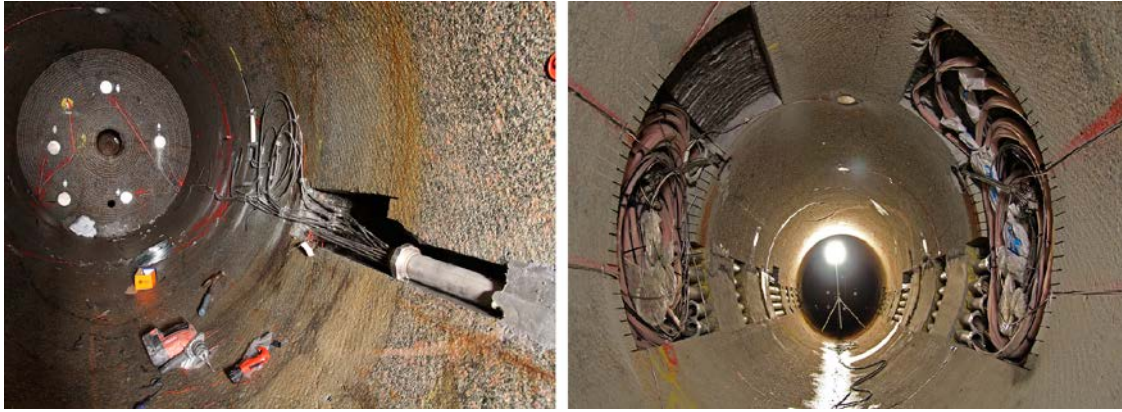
To the left ongoing connection of the sensor pipes, five total pressure sensors are clearly visible at the drift end. To the right the MPT test section ready for installation with all cables and pipes outside the drift perimeter.
